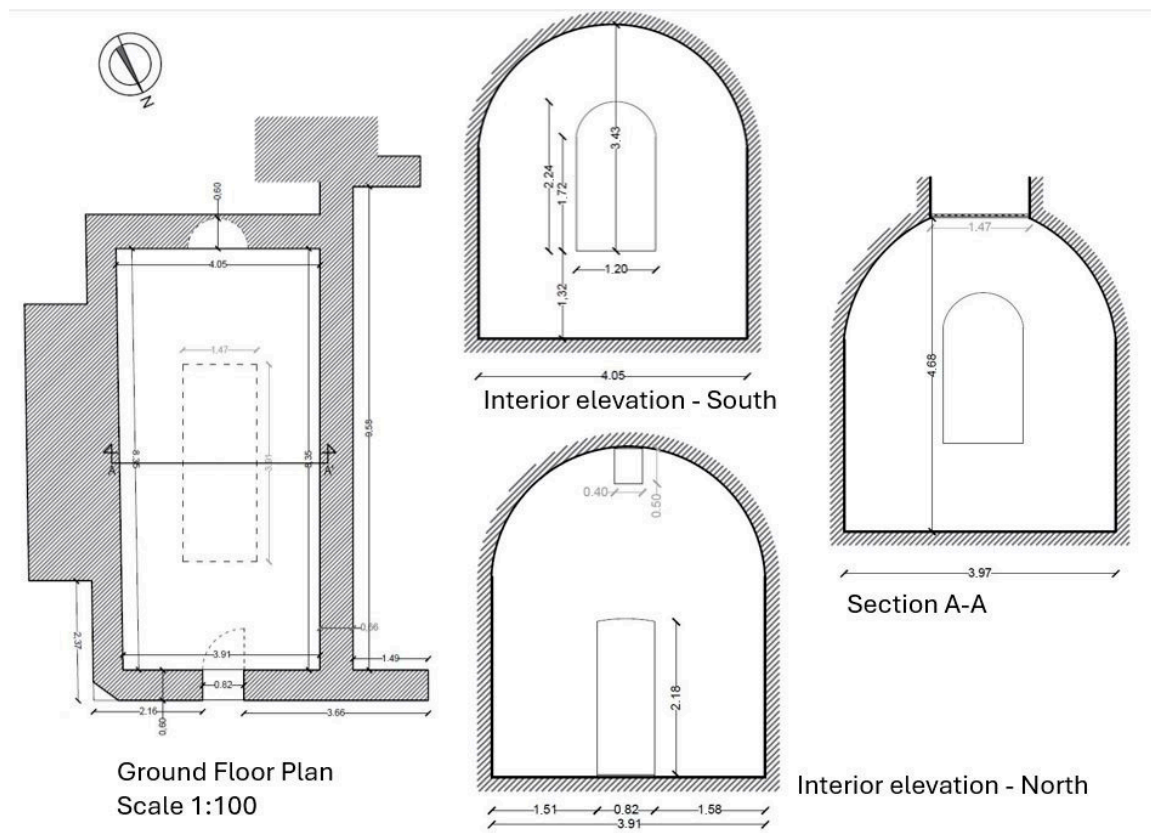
Museéto architectural plan with three sections at the beginning, middle and end of the room.
